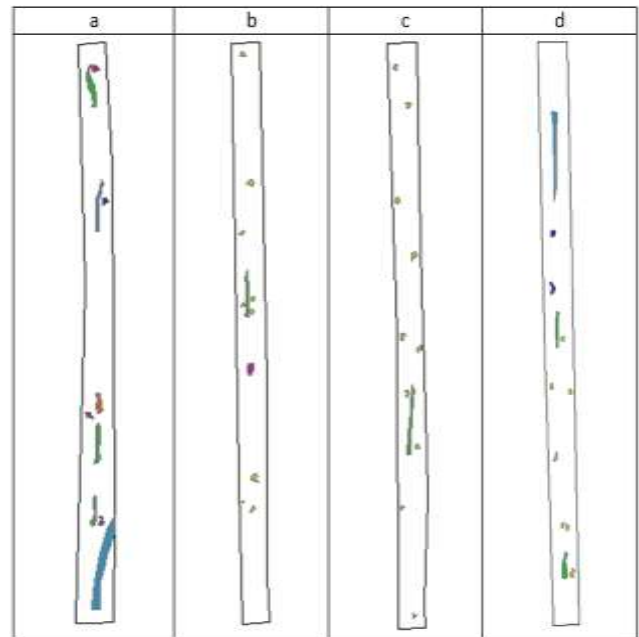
Segmented pavement distress of section 5, JU School and College to Pandoya Bazar Road Moor
